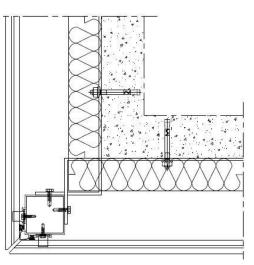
External corner with mitre joint and corner profile. FAVEKER® FV GA20 FTS502B system.
